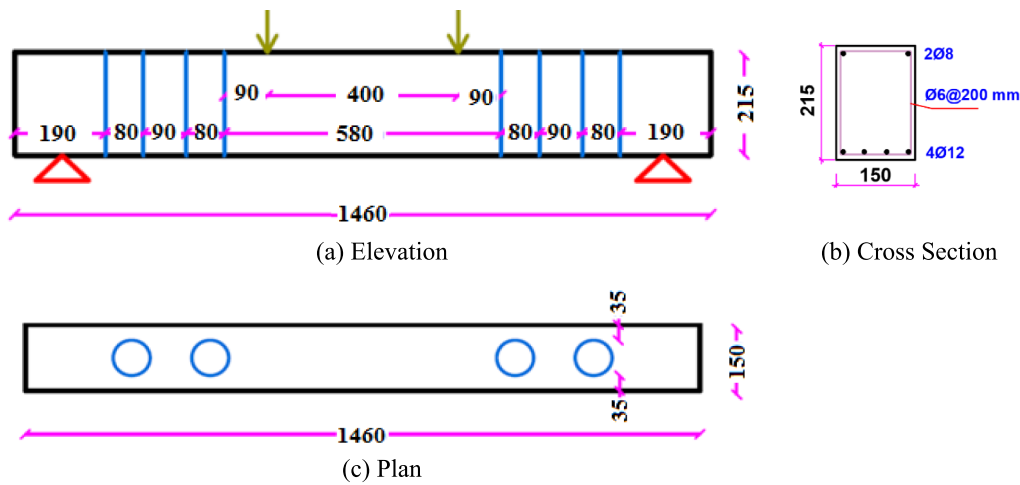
Dimensions of beam specimens and the location of the two openings in detail. (Dim in mm)
